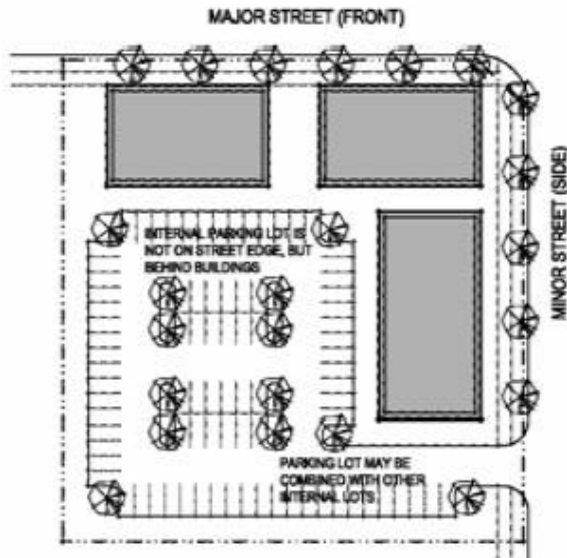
Example of parking permitted in the interior of a lot or behind a building.
